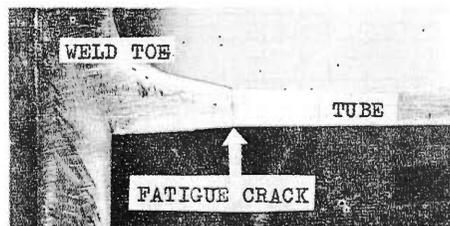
Cracking in the Transverse Section of the Weld Toe; Specimen A-11, the 1900th cycle, Crack about 30mm long, 0.1mm wide in the tube surface
